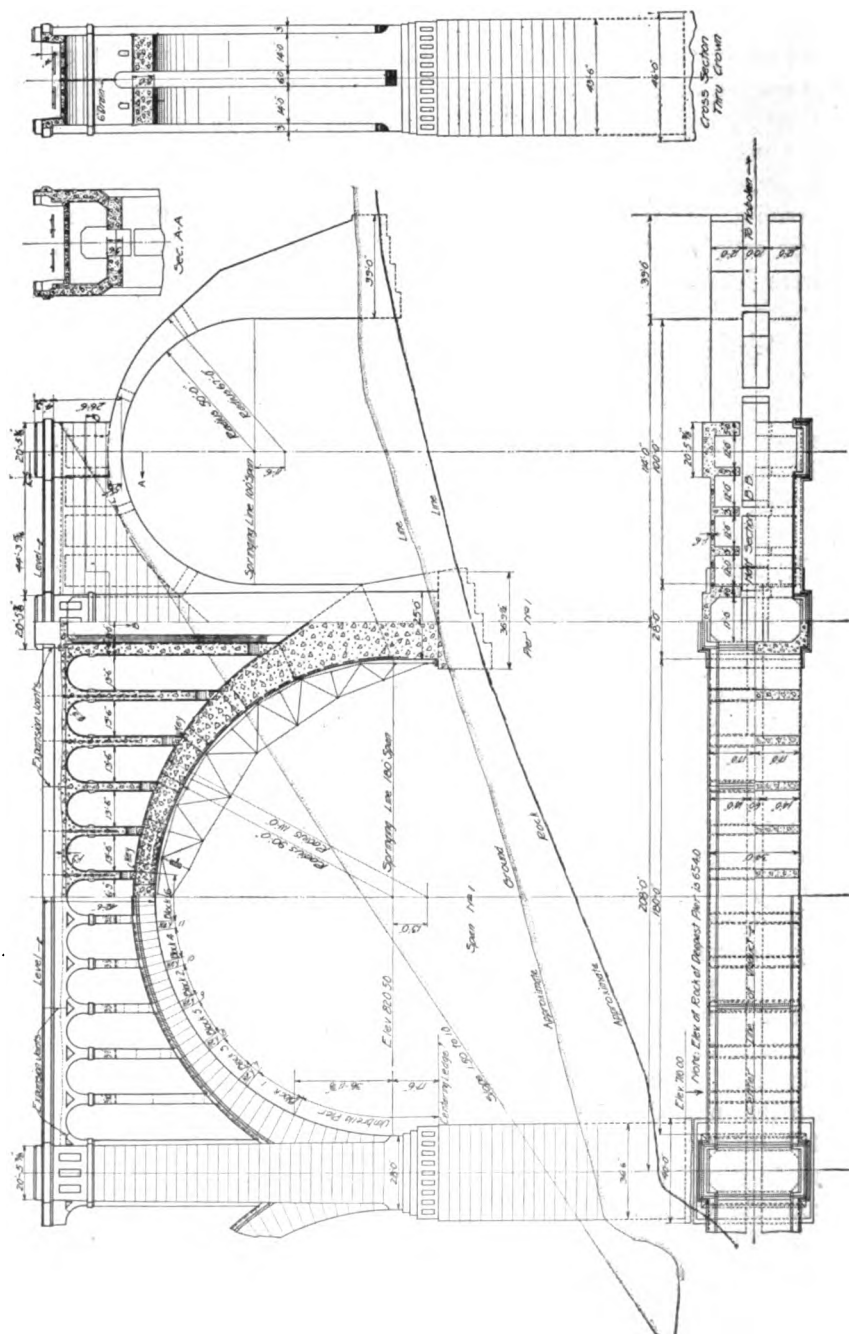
DETAIL DRAWING OF 180-FT. ARCH AND 100-FT. ABUTMENT SPAN, TUNKHANNOCK CREEK VIADUCT.
